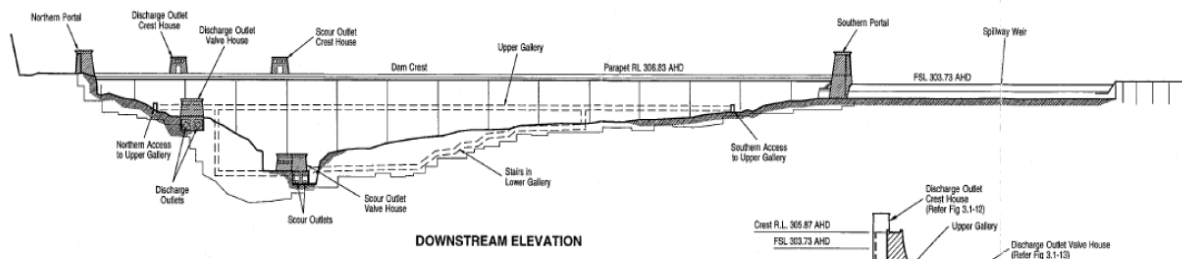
Elevation of the Cordeaux Dam Wall (Source: WaterNSW, 2015)
